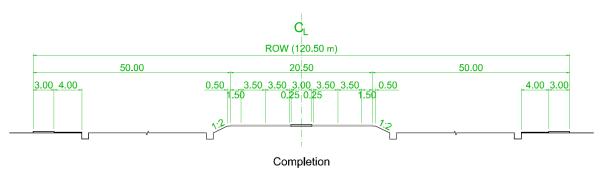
Typical Cross Section for Nacala Port Access Road (At Completion)
